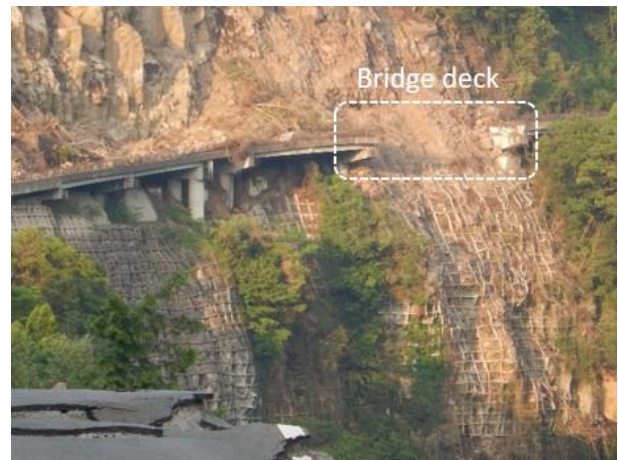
Landslides caused also the collapse of bridge decks in the mountainous areas of Mt. Aso volcanic caldera (N 32.8752; E 131.9886). See also Photo 17.
